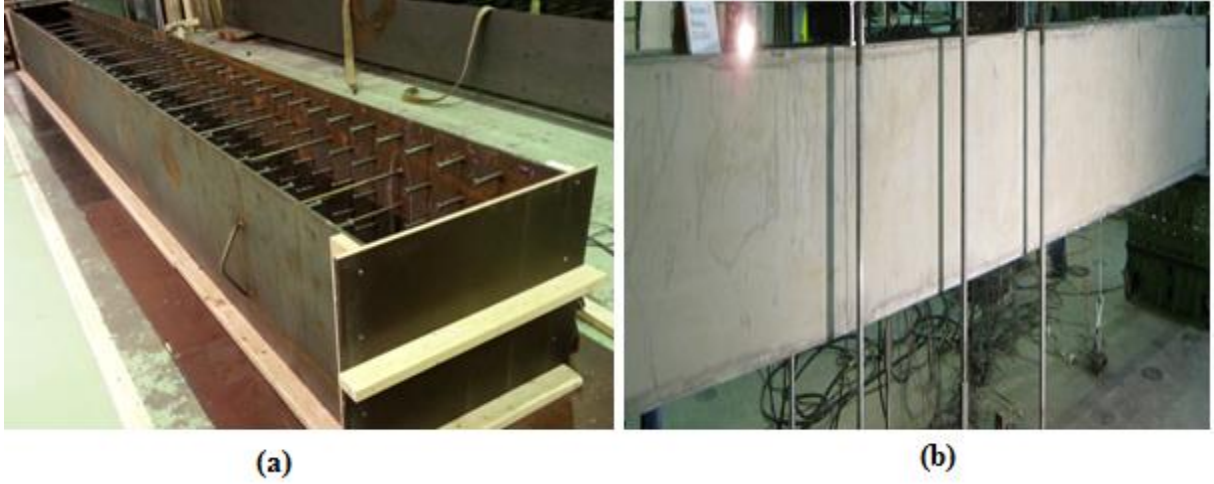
(a) Steel frame and (b) after concreting of SC beam [17]
